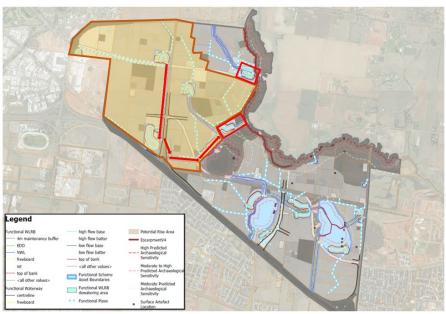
Draft Drainage Services Scheme – adjacent to future Warrensbrook PSP and Kororoit Creek
